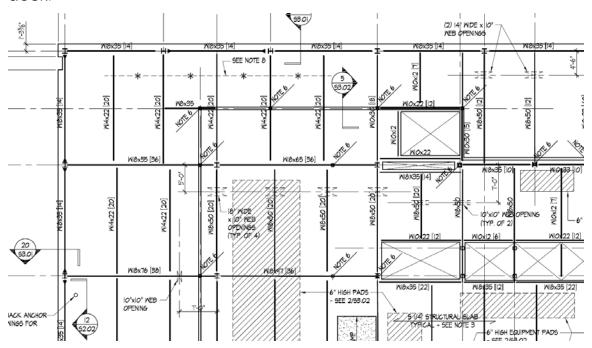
/ Partial Main Roof/Penthouse Framing Plan
